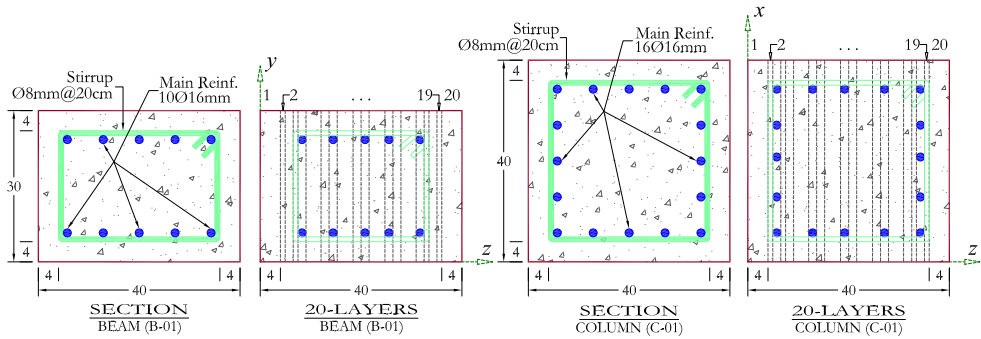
Structural drawings (detailed sections of columns and beam) of a typical one-storey construction.
